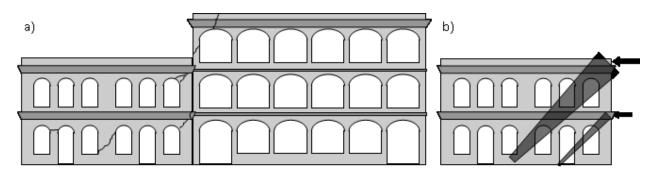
Damage to URM buildings. a) Typical pounding damage. b) Idealized masonry strut damage. Arrows denote floor collision points of the adjacent building. Width of the shaded zone indicates approximate severity of damage. Figure reproduced from (Cole et al. 2012).
